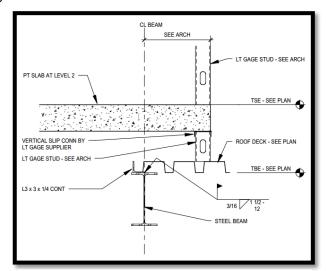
A section through the link bridge roof connection detail to the third floor
